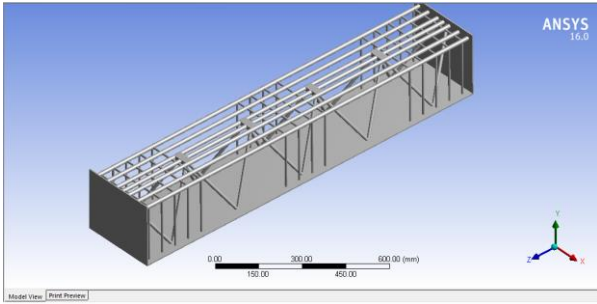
Reinforcement Detail of Warren Form Trussed Beam
